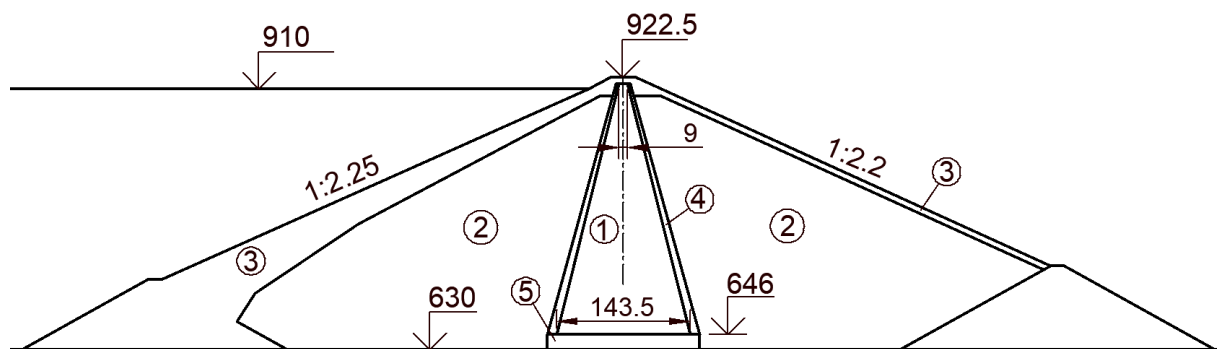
Design scheme of earth core rockfill Nurek dam structure in vertical section:
